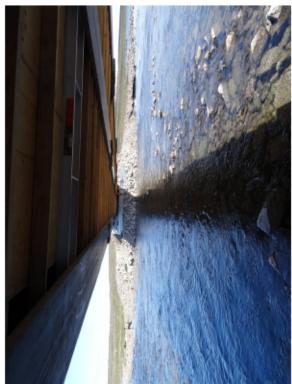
Soffit of bridge and temporary access platforms (looking south)
